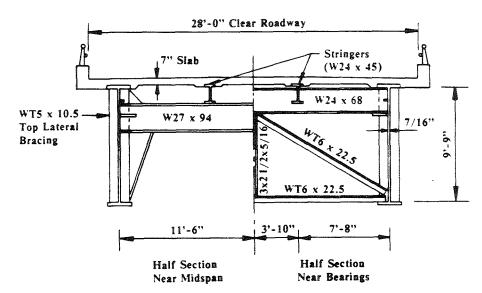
Cross section of 180-ft simple span, noncomposite two-girder bridge (Ref. 55).
